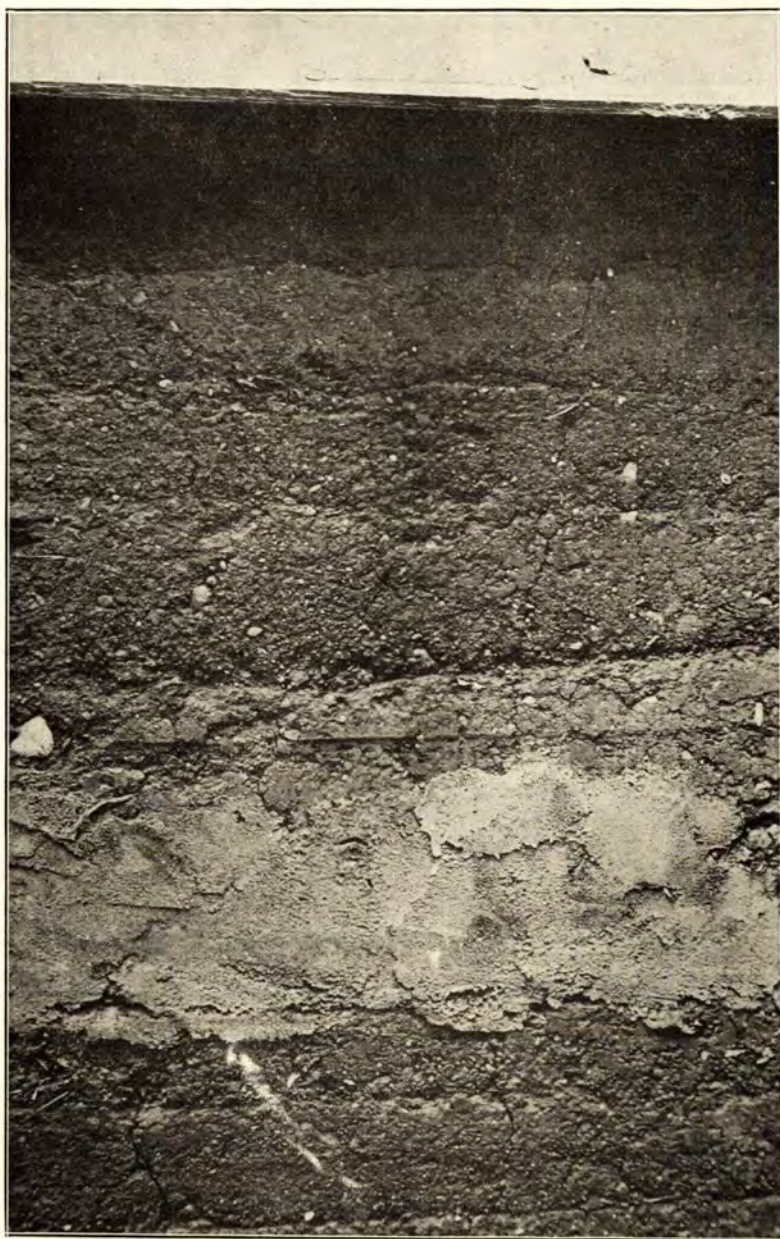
REPAIRING HOLES IN A RAMMED EARTH WALL.
